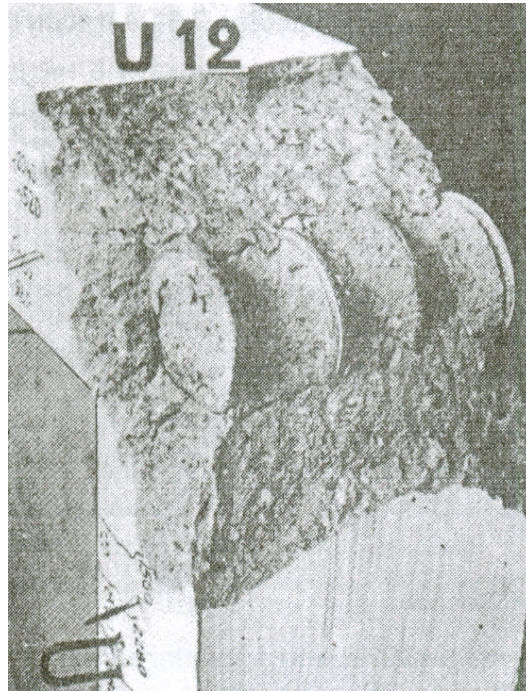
Spalling of the compression zone under opening moment [Nilsson (1973)]
